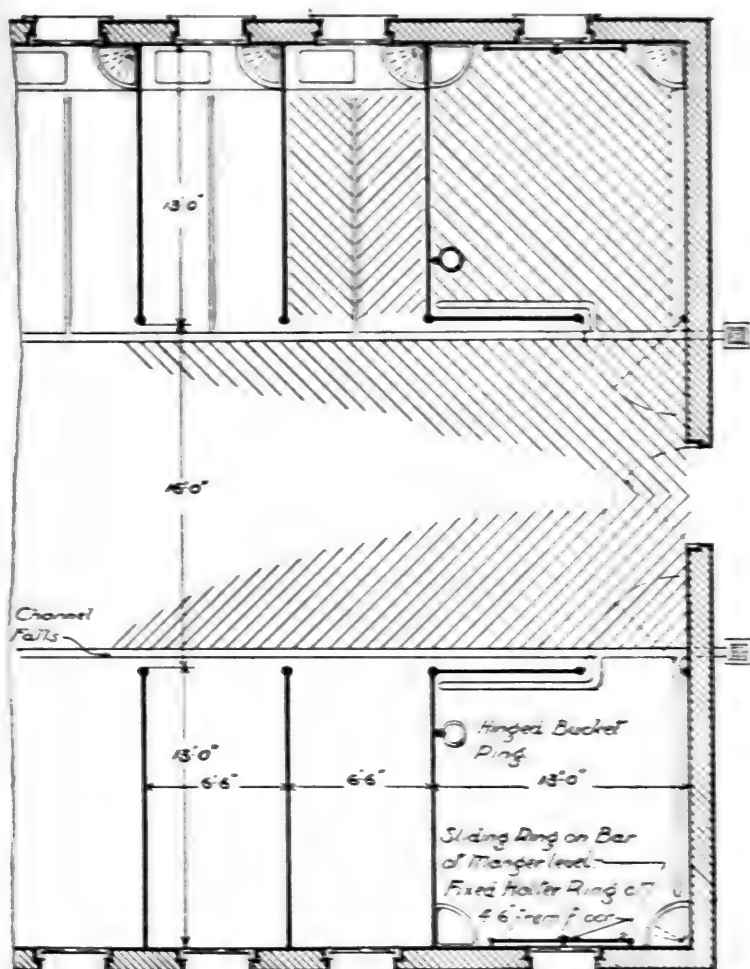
Plan of a double stable for heavy draught horses. The bucket ring in the loose box should have been shown fixed to the end wall. The stable door may open outwards if desired.
